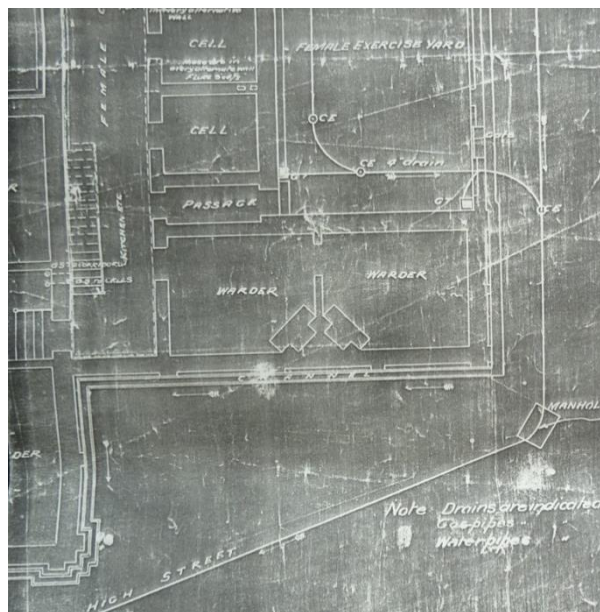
Extract of the earliest surviving plan of Dunedin Prison, showing Warders occupying the ground floor of the projecting two-storey wing at the northeast corner of the building. (Source: undated plan circa 1916 found in the prison)
